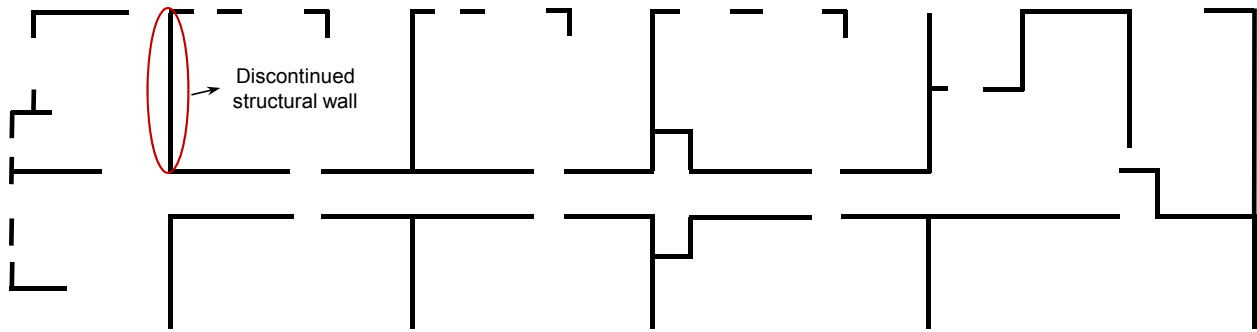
Sketch of plan view for Alto Río condominium (the sketch is based on the information provided in the reconnaissance report by the Los Angeles Tall Building Structural Design Council)
